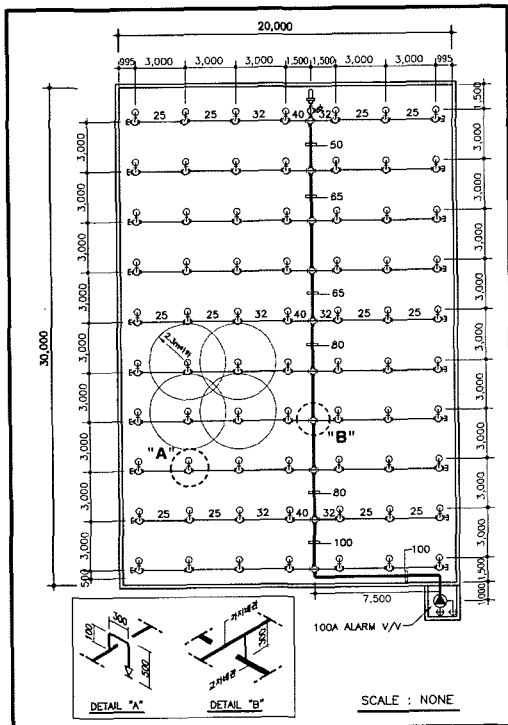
Plan View of Pipe Schedule Sprinkler System(Case "3", Korea).
